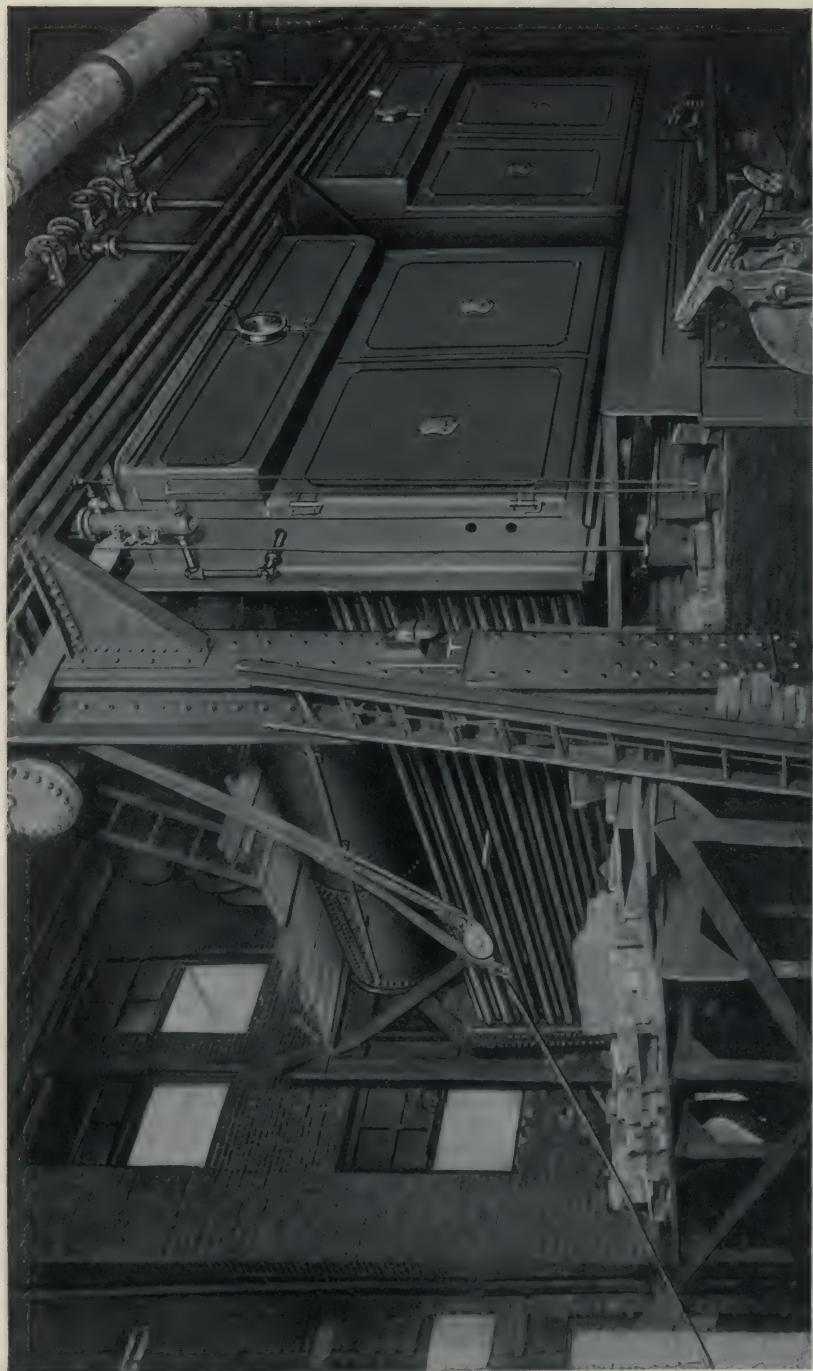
Side Feed Stoker and Extension Furnace Setting.
